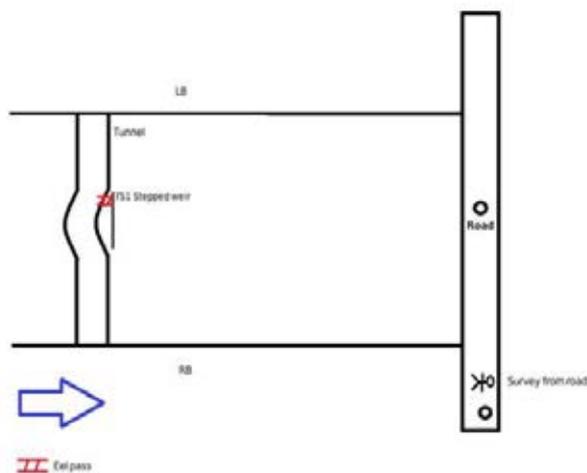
Site plan for Duke of Northumberland's Barrier 1
